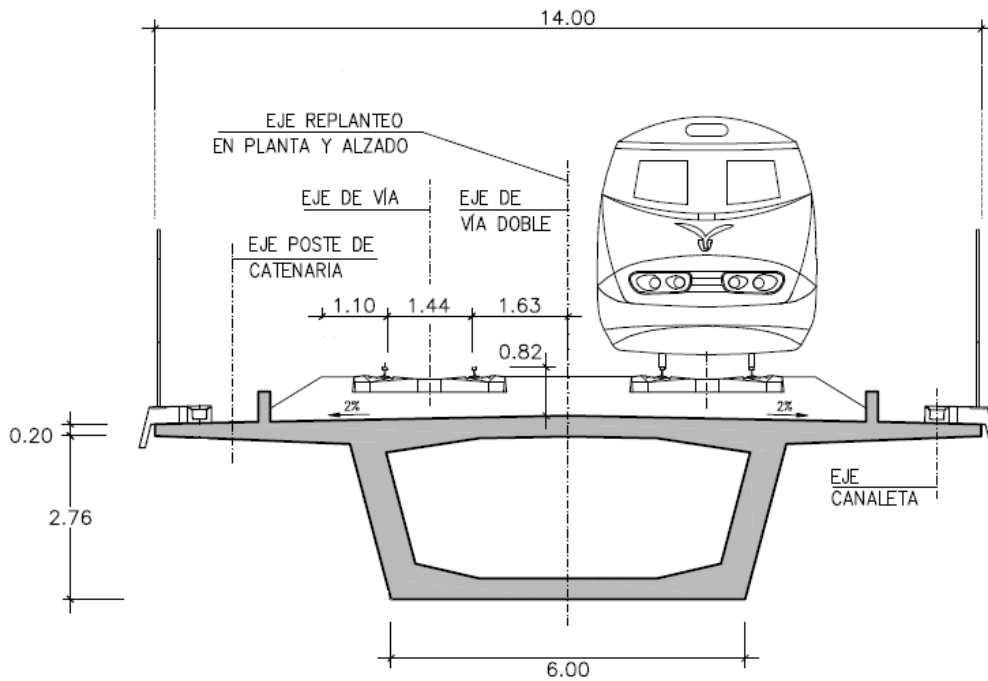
Deck cross-section type. Source: construction blueprints.
